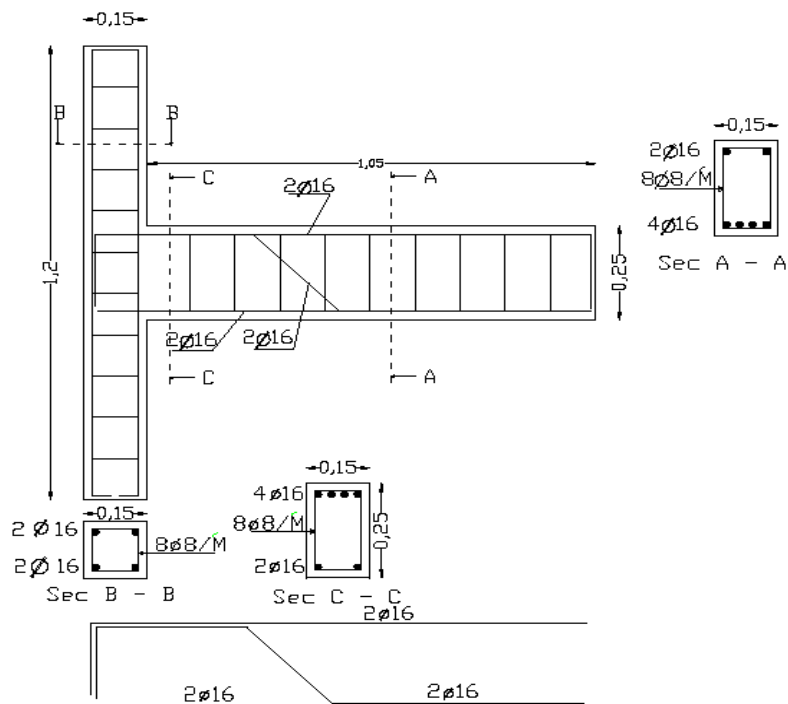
Specimen Geometry and Load Argument of RC Beam-Column Connection
